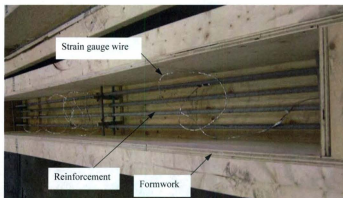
Top view of typical formwork and reinforcement layout (before placing the top cross bracing for the formwork)
